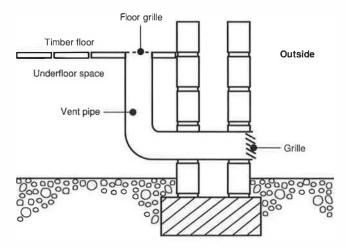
An underfloor ventilated air supply provides outside air to living spaces
